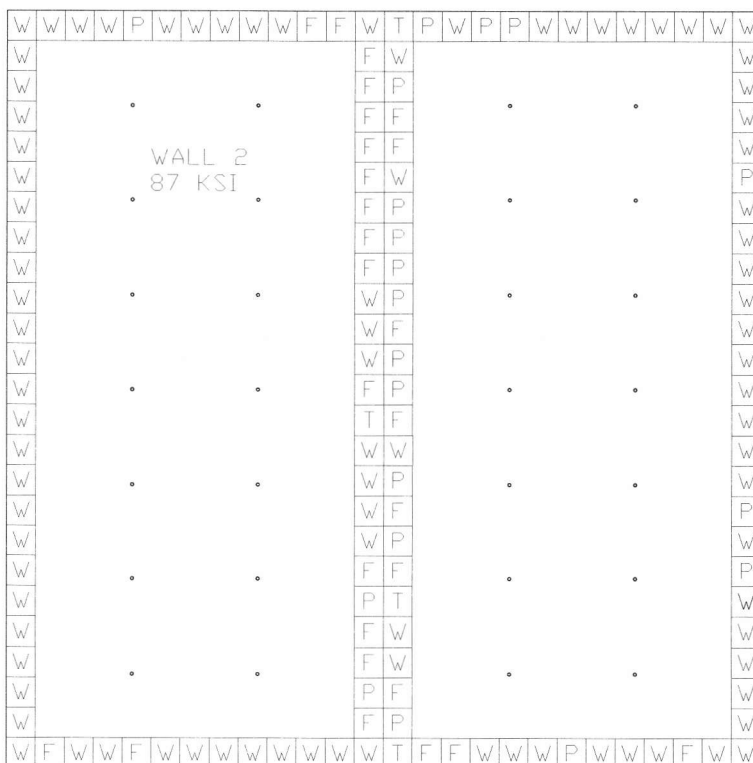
Sheathing nail failure modes for Wall 2, $f_{yb}=87$ ksi.
